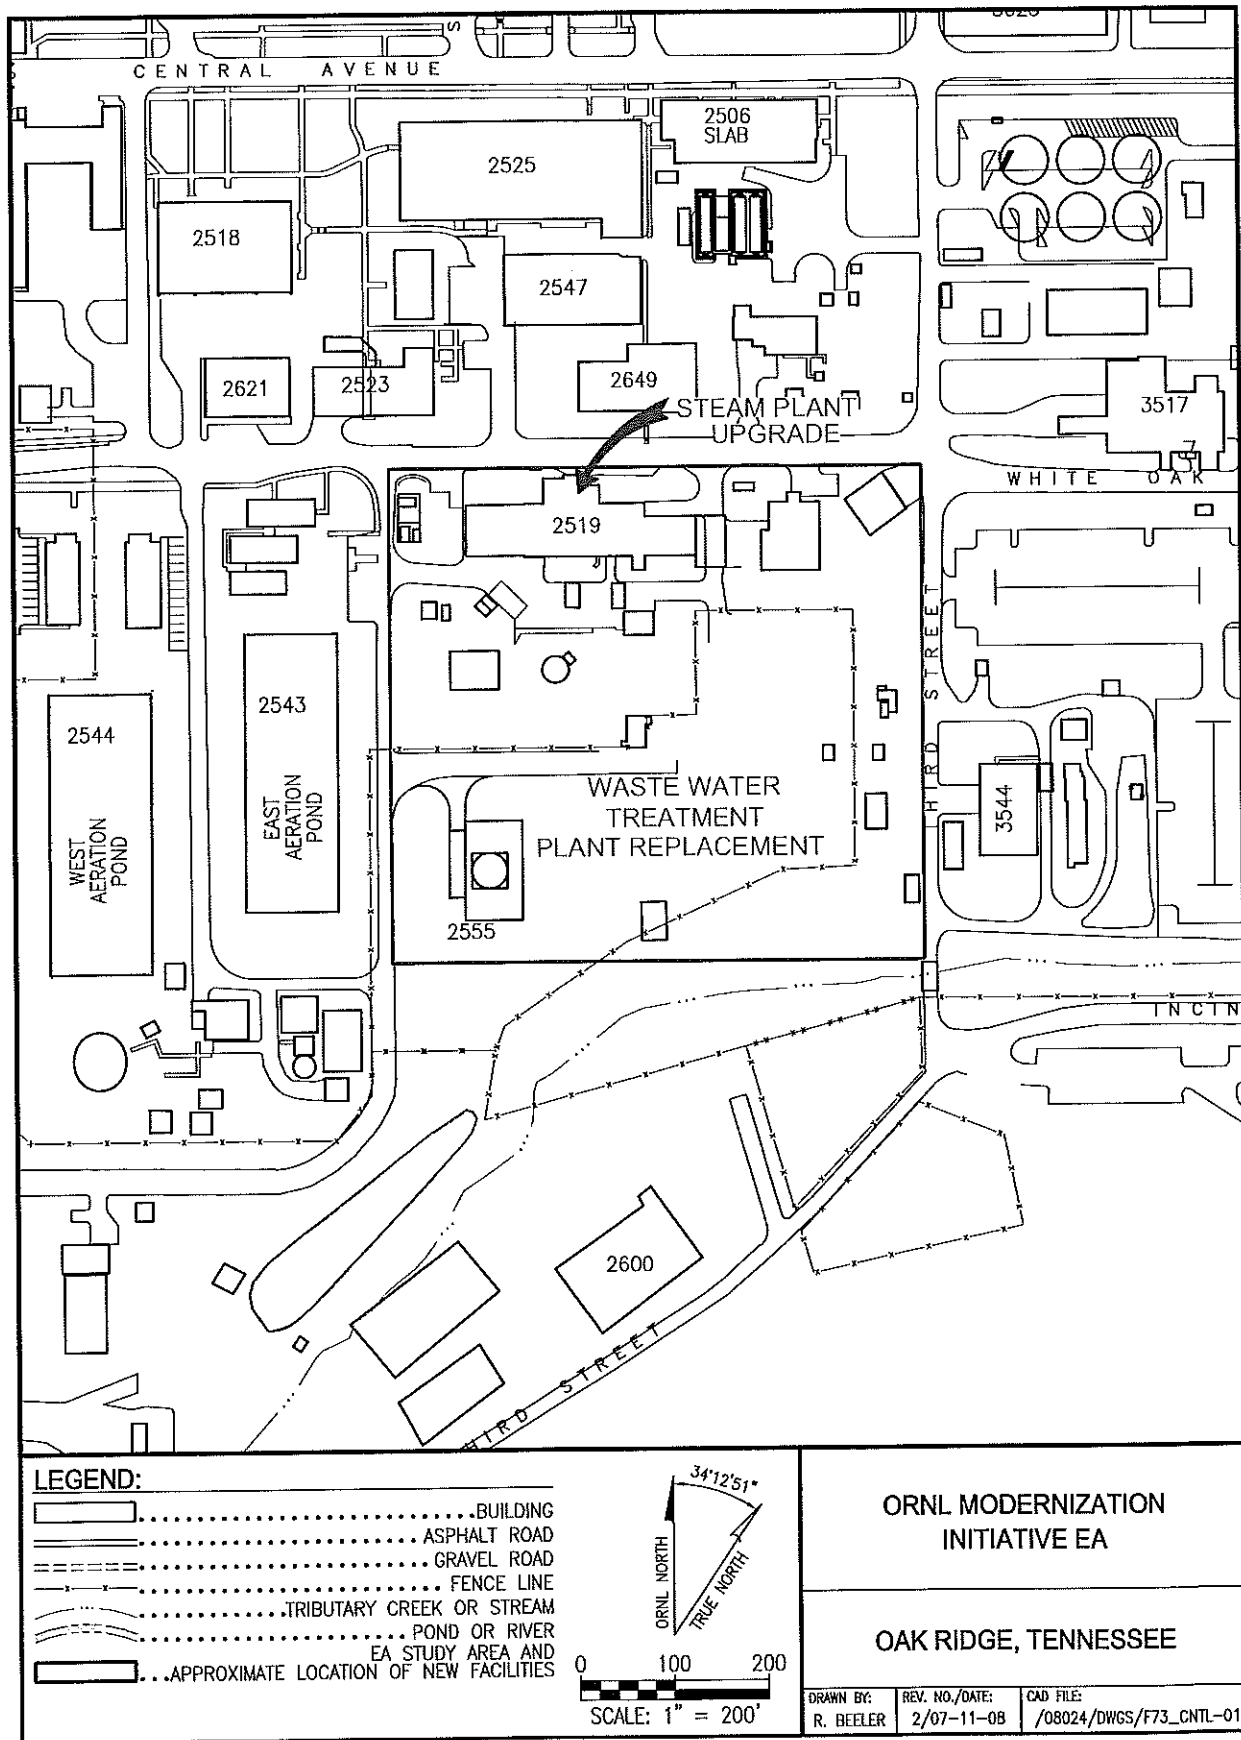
Central Campus steam plant upgrade and wastewater treatment plant replacement.
